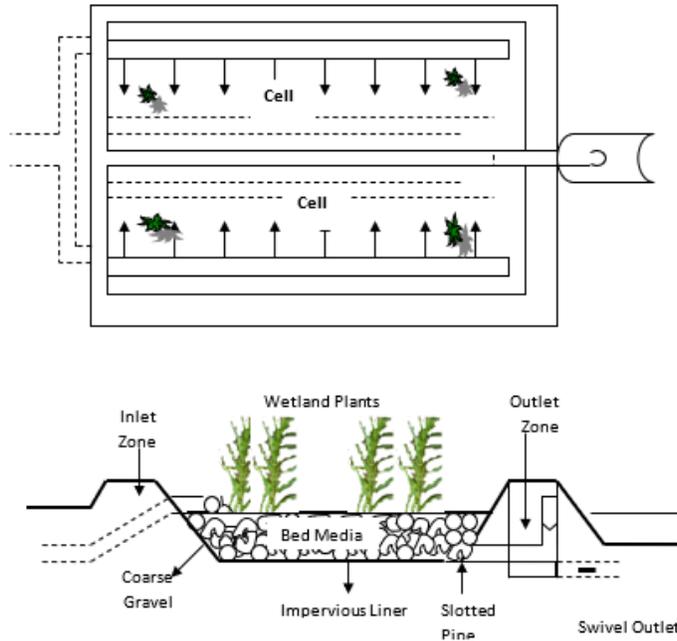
Plan and Cross-Sectional View of a Subsurface Flow Wetland Wallace and Knight (2006).
